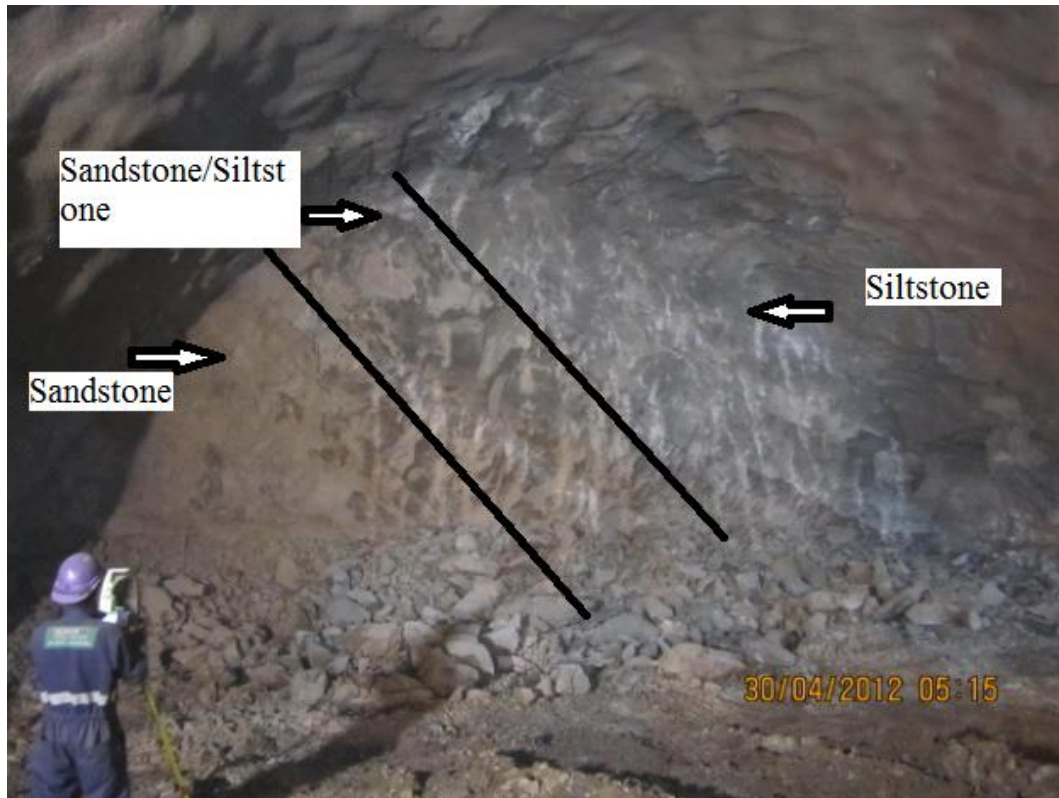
Murree formation of the South face (Source: Goel et al. 2012)
